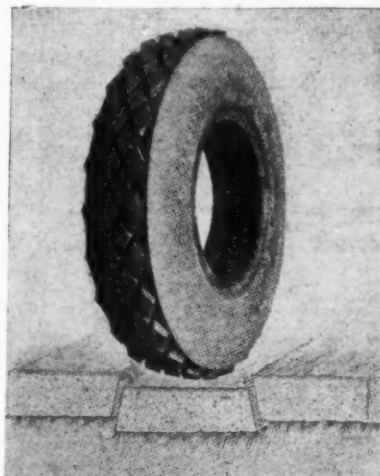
A HEAVY WHEEL LOAD BREAKS THROUGH THE PAVEMENT
